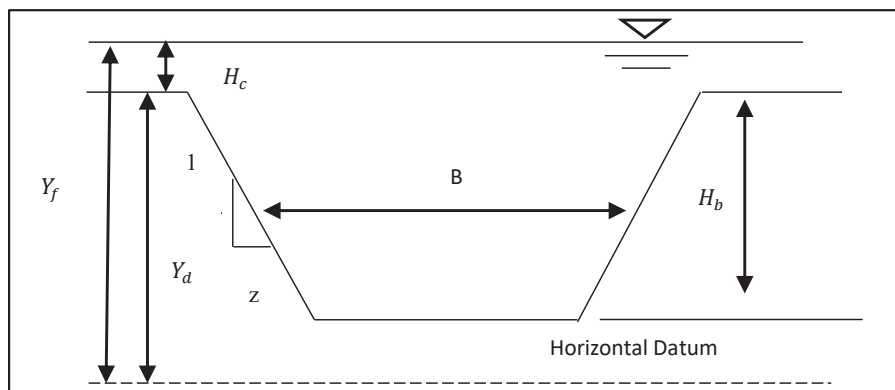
Typical sketch of Trapezoidal breach in Dam (Froehlich 2008)
